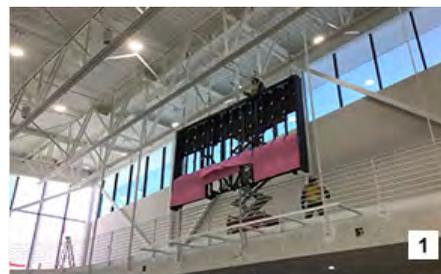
Crews wiring LED scoreboard in the gymnasium. (2) Installing hand rails on the track in the fieldhouse. (3) Installing frames throughout Areas 6 and 7.
